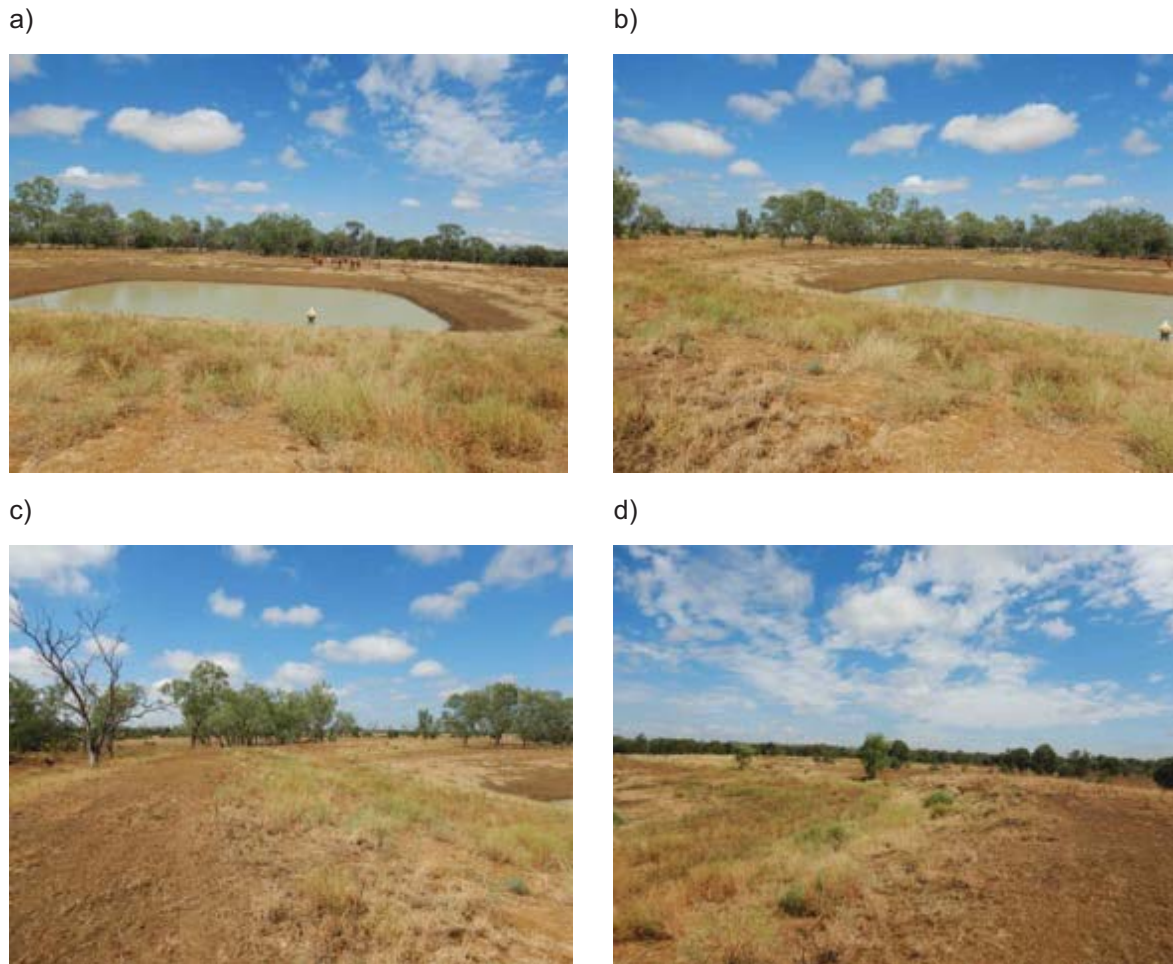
Site 65 showing a) upstream toward dam, b) left bank of dam, c) dam wall extending away from dam to catch/direct overland flows, and d) toward dam overflows
